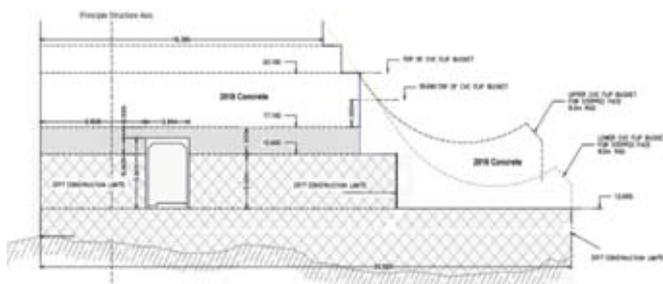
North Dam construction progress 30 Sep 2018 (cross-hatched area).
